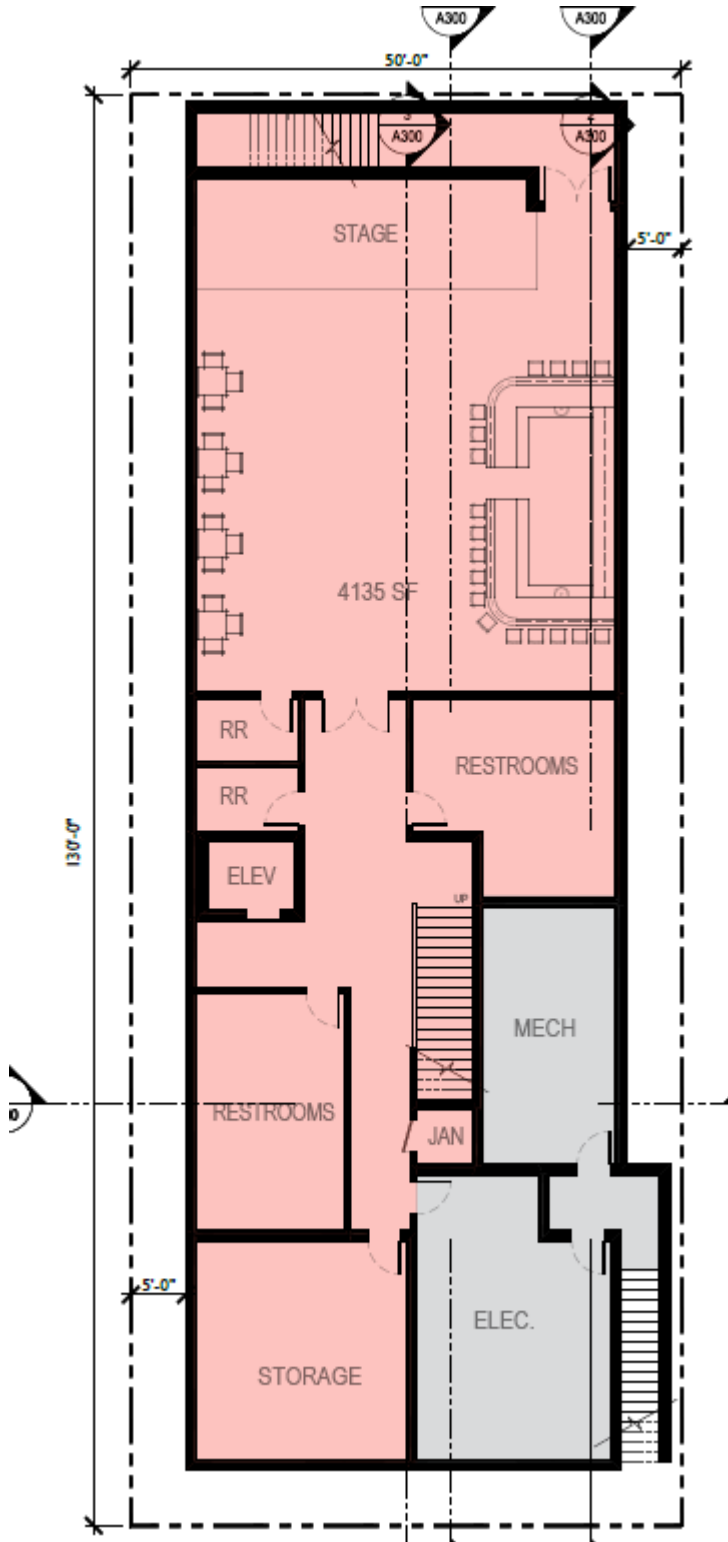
Commercial Floor Plan, Level 2 (Food Service Establishment)
